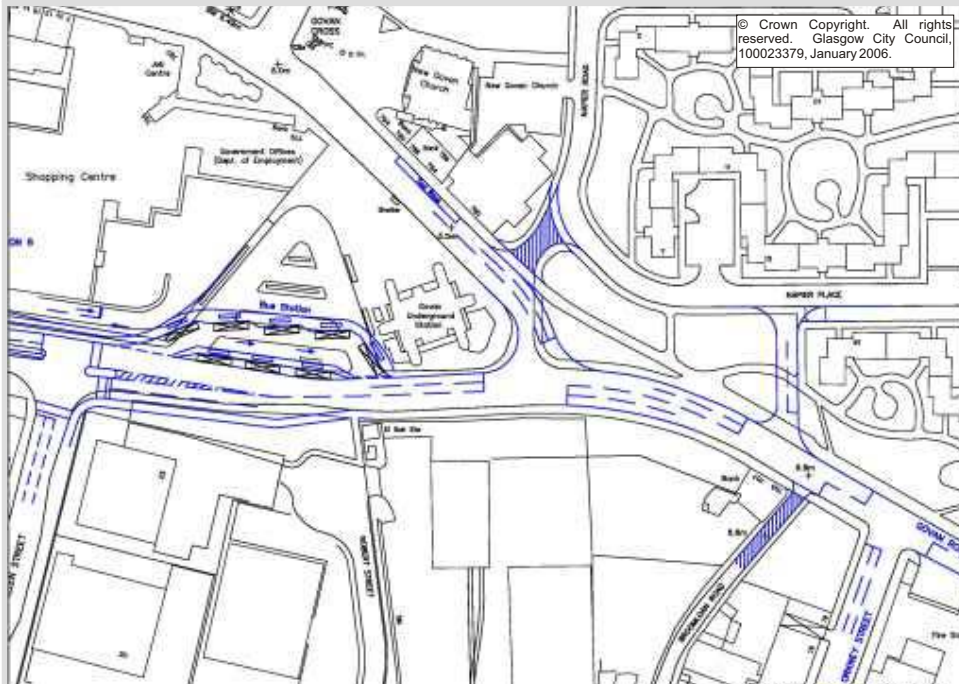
GOLSPIE STREET / GOVAN ROAD (WEST)
